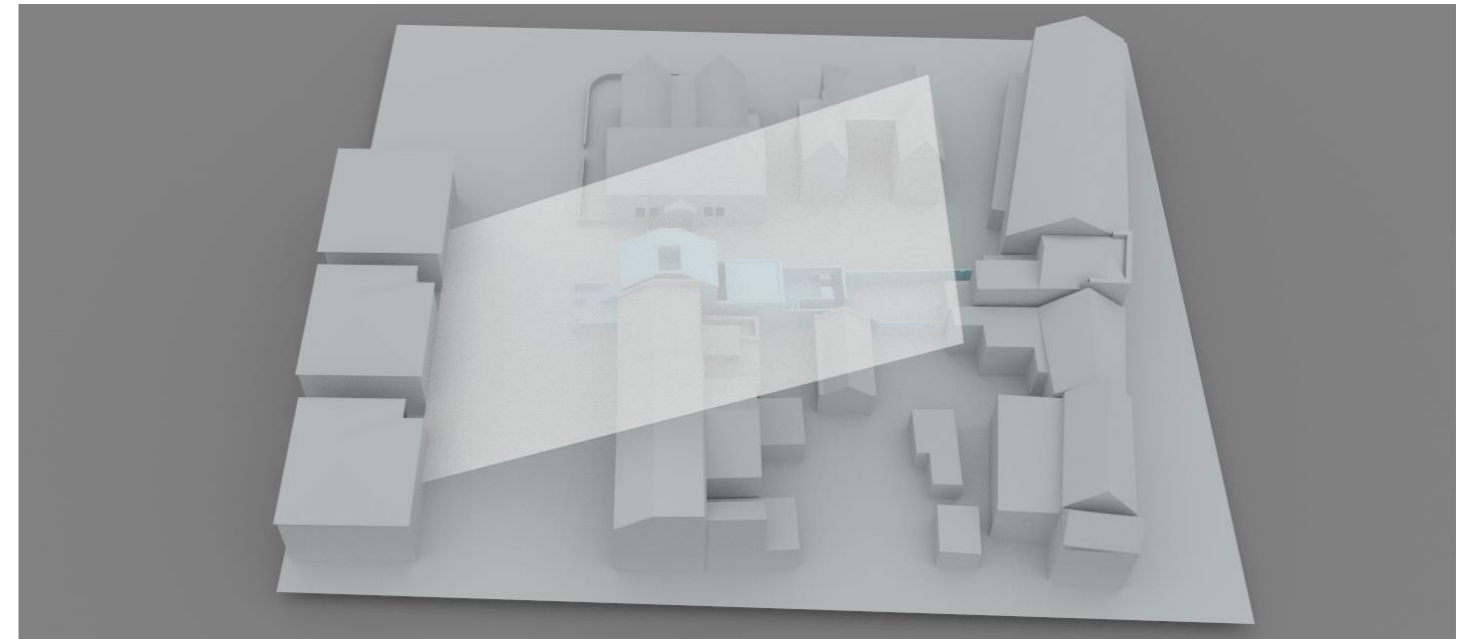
25-degree test met by ground floor windows at 8 Ellison Road.
